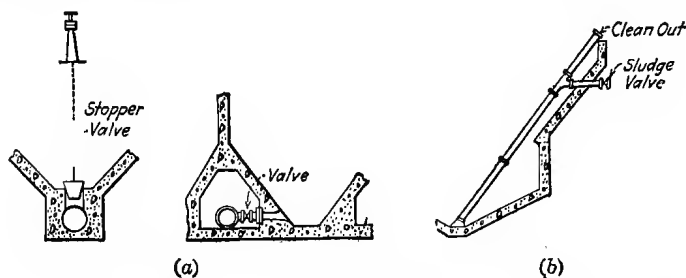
Details of piping for drawing sludge from hopper-bottom tanks.
